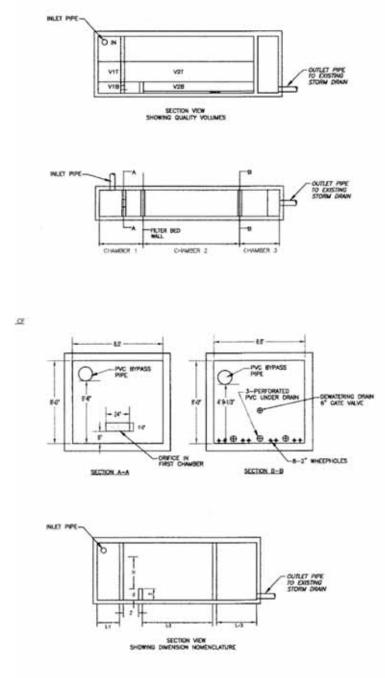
Plan and Section Detail of the Existing Three Chamber
